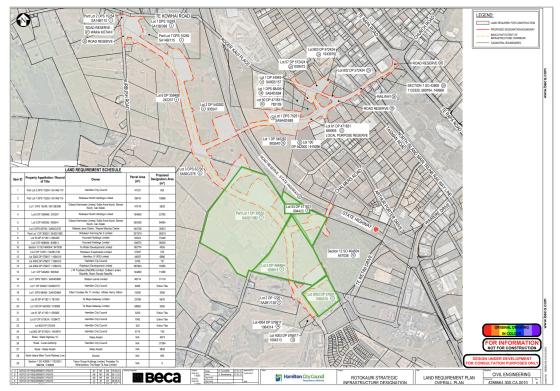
NoR Land Requirement Plans (Source: Beca NoR application documents)
